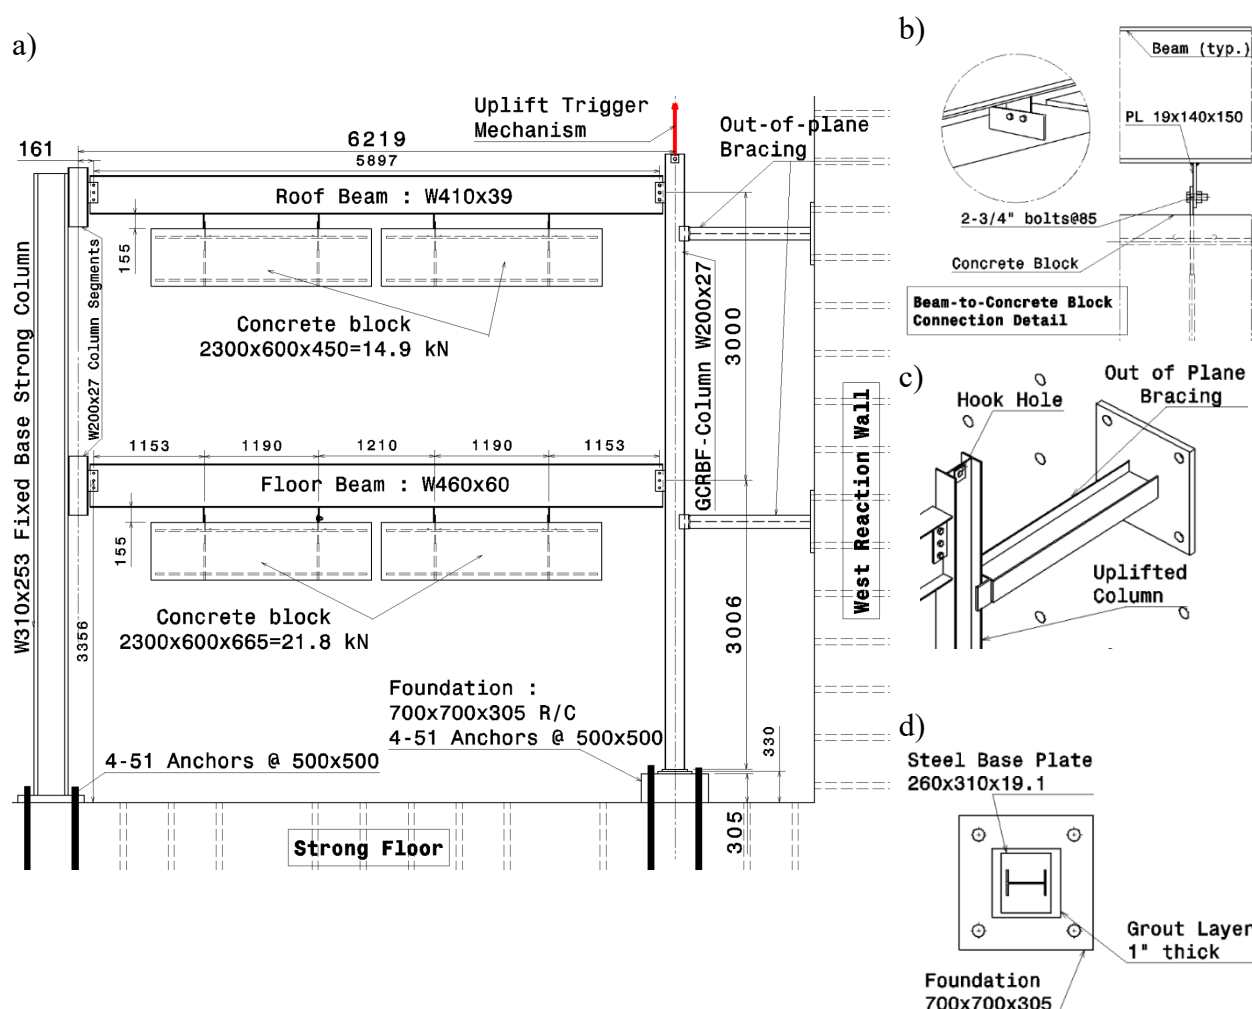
Test setup: (a) Elevation view; (b) Detail of beam-to-mass connections; (c) Detail of the column guides; and (d) Detail of the GCRBF column base plate and foundation.
